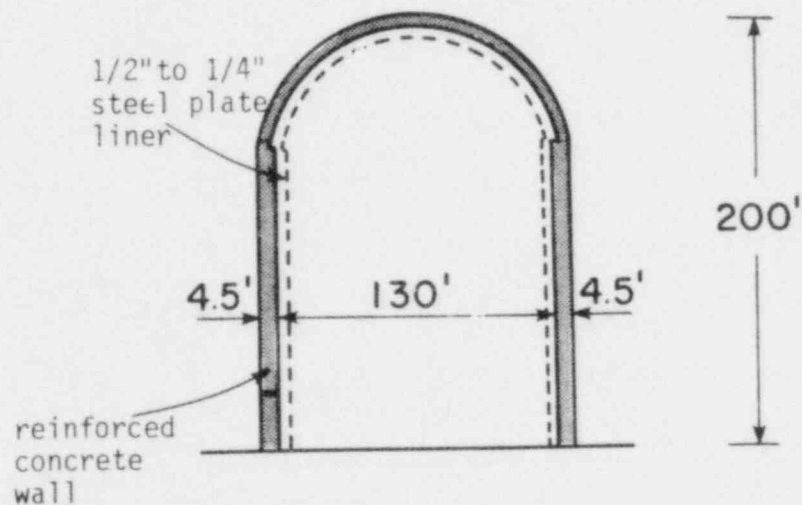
Dimensions of a reinforced concrete containment vessel.
